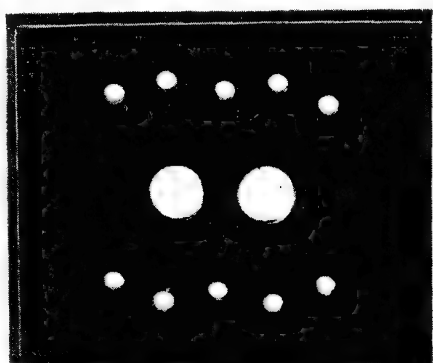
An ebonite panel is drilled with stud holes, and the two spindle holes in the centre are bushed to take a 2 B.A. screw rod
